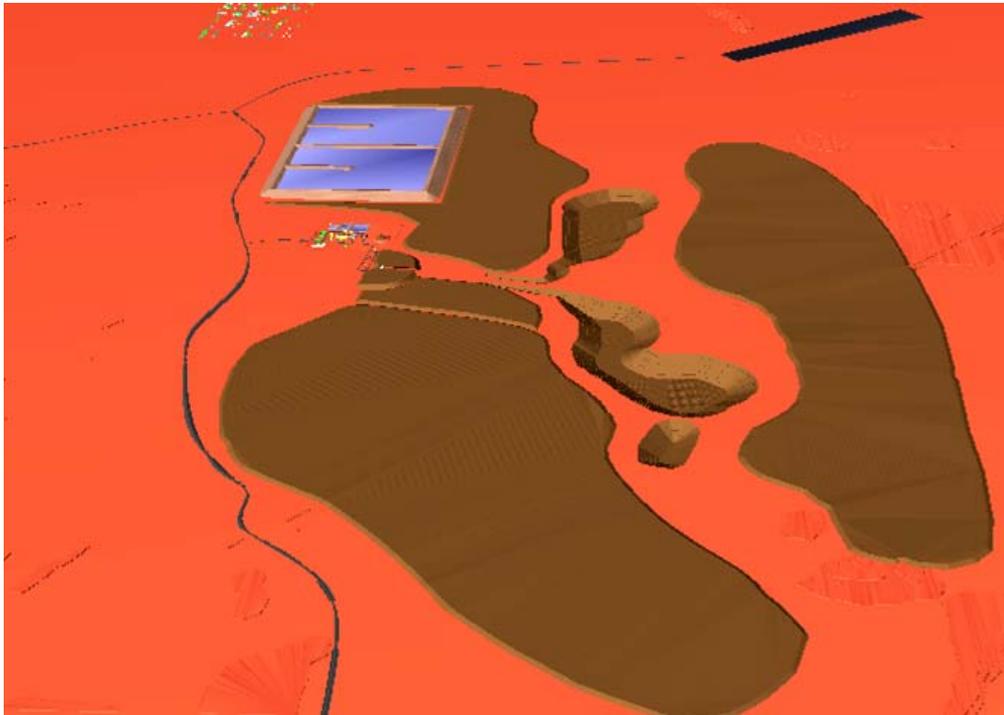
Layout for Waste Landforms, Tailings Storage Facility and Mine Voids
